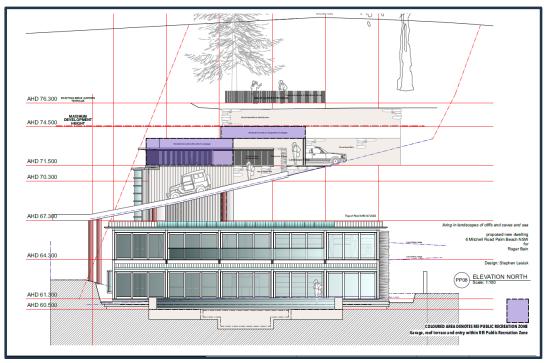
Concept Circulation Plan detailing the garage as below the Bible Garden and height limit (Souce: Housed Architects)
